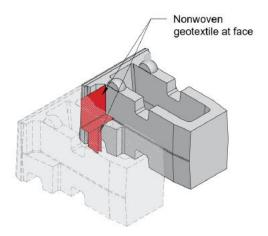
Non-woven geotextile separator between blocks to prevent loss of drainage stone
